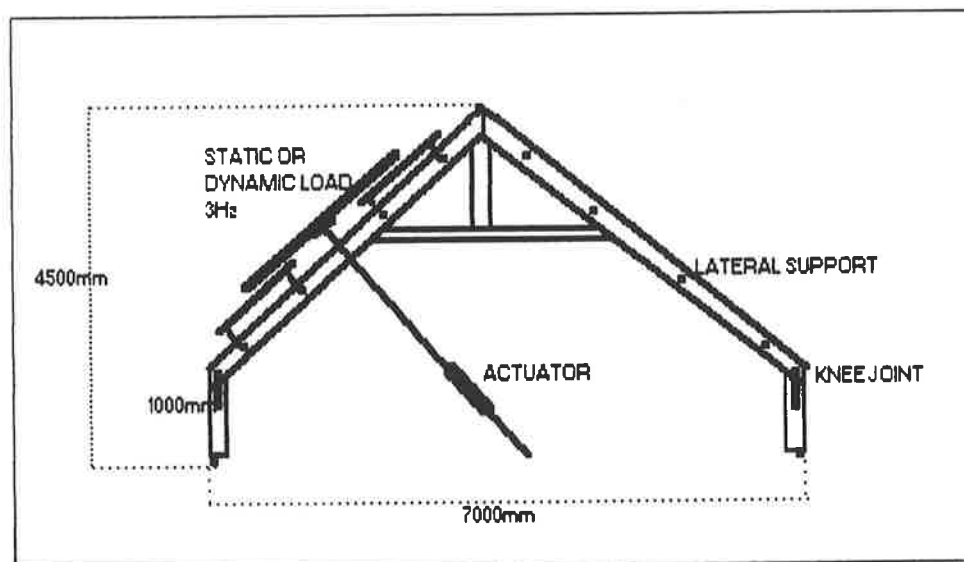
Test set-up in the full-scale testing of prefabricated timber frame
